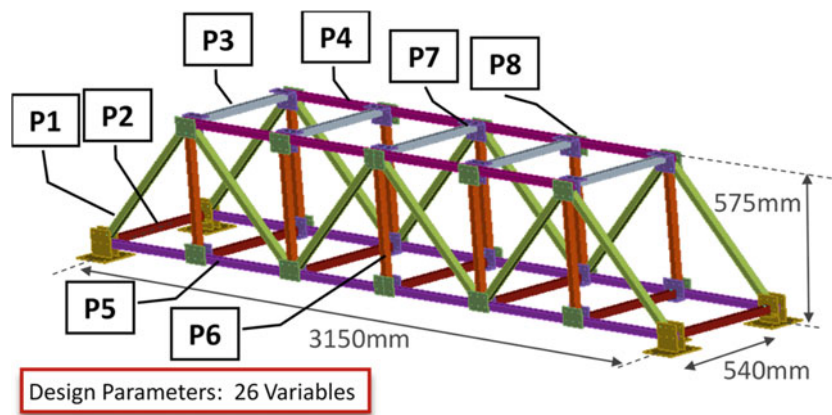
Parts of the parameterized FE model. Detail of the FE model of the laboratory-scale truss bridge
